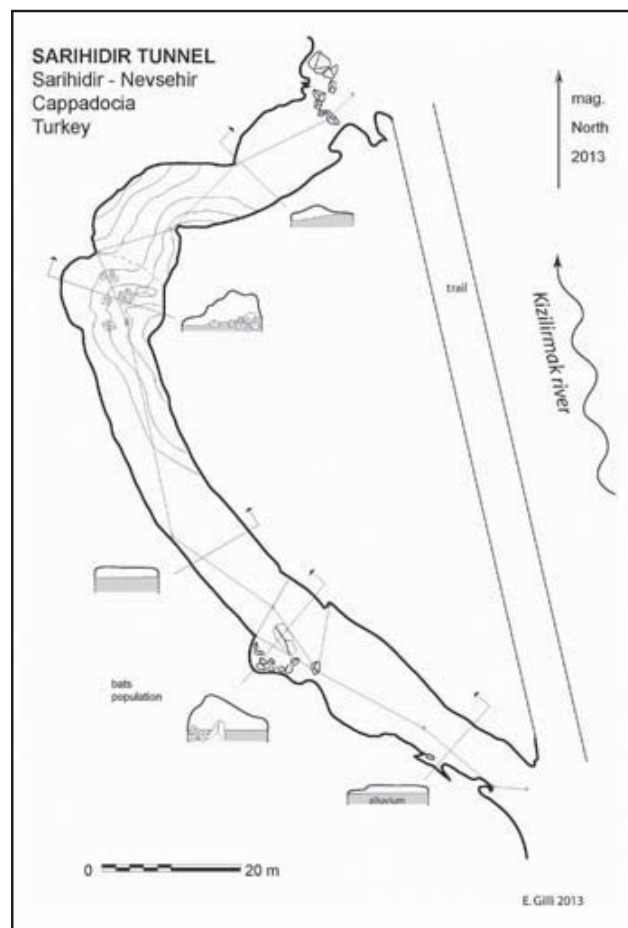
Plan of Deviation Tunnel (drawing: E. Gilli).
